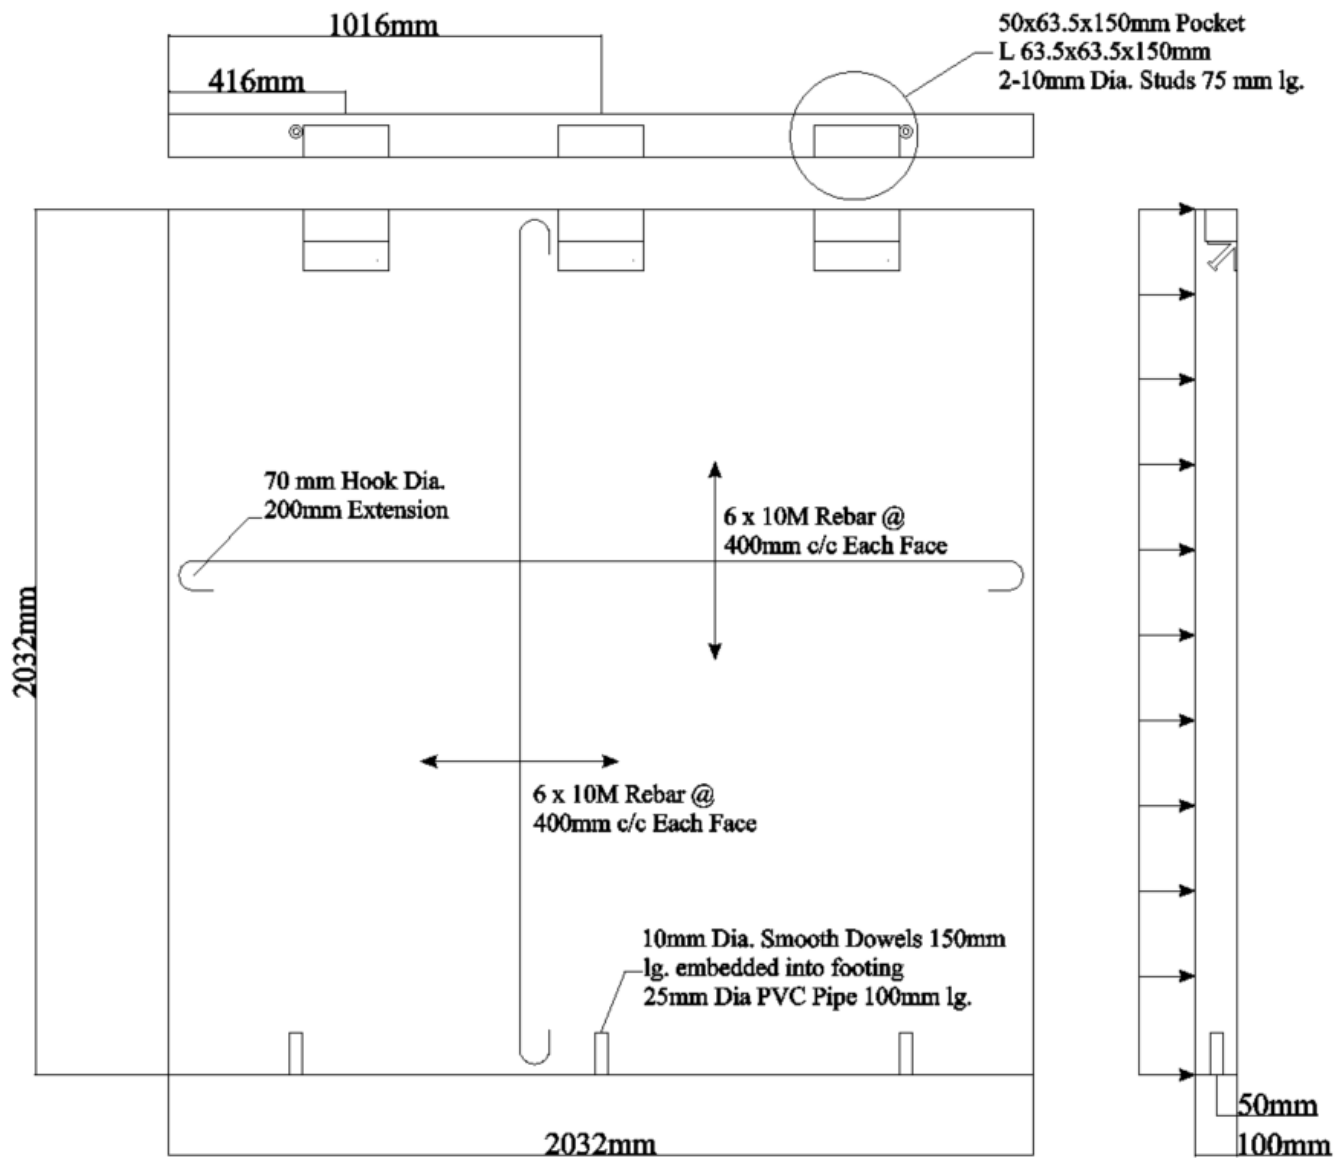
Reinforcement and Connection Details for Control Panel SRC-1
